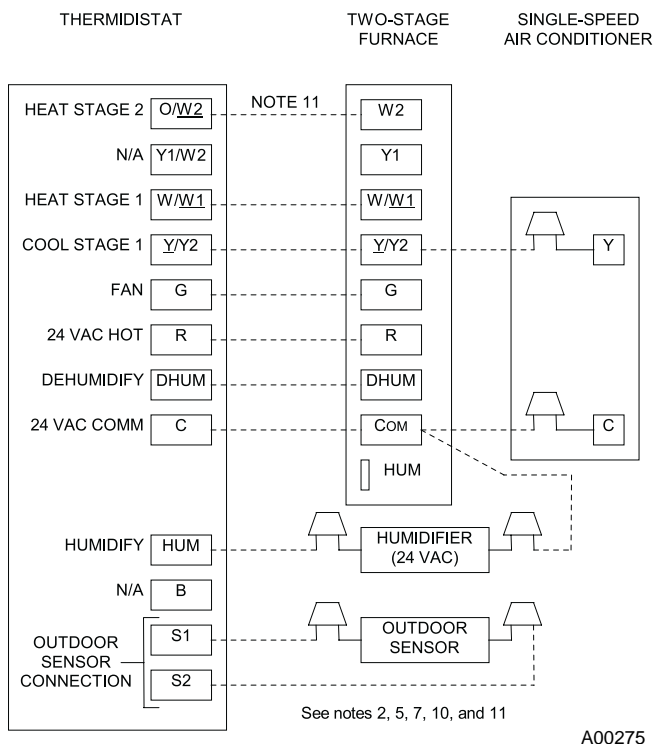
Two-Stage Furnace with Single-Speed Air Conditioner
